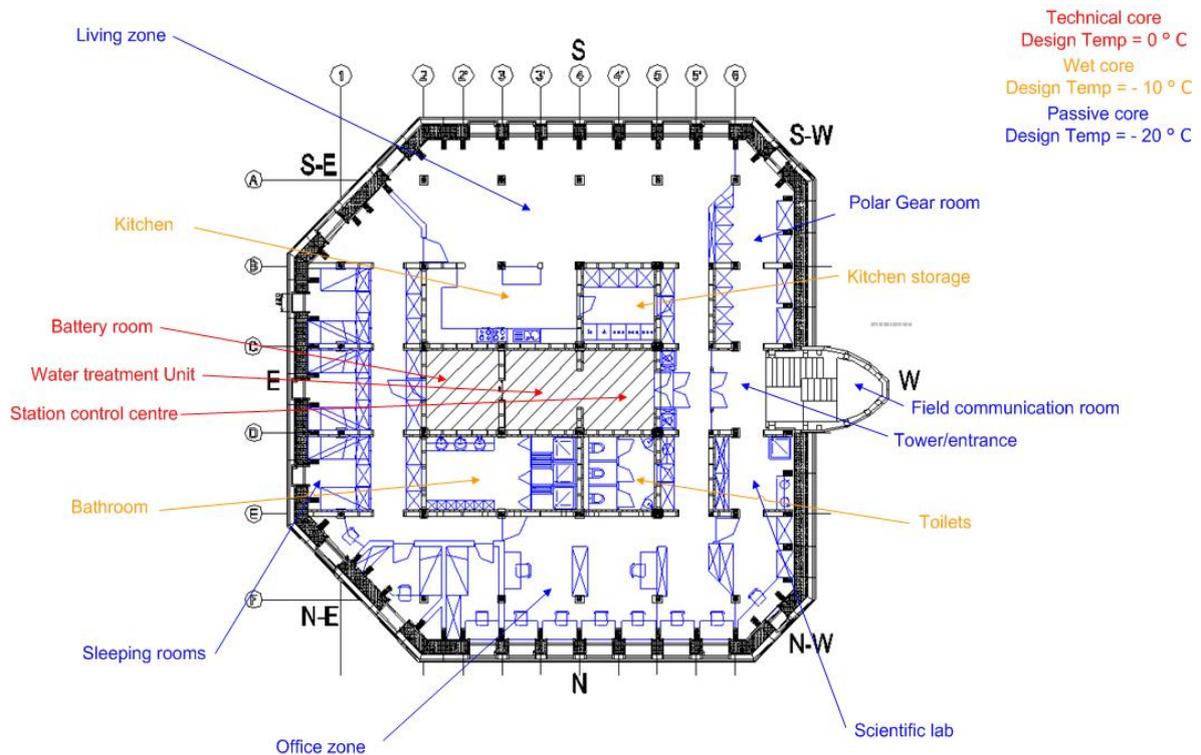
Building layout (dimension: 22 x 22 m) [1]
